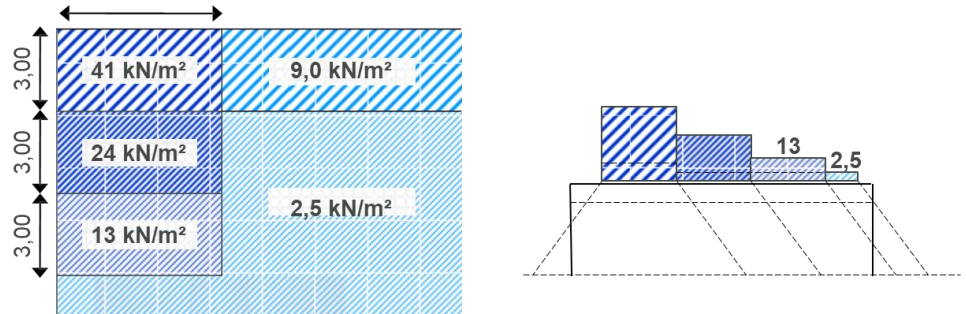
Road traffic-load model 1: a) ground plan; b) cross-section [19].
